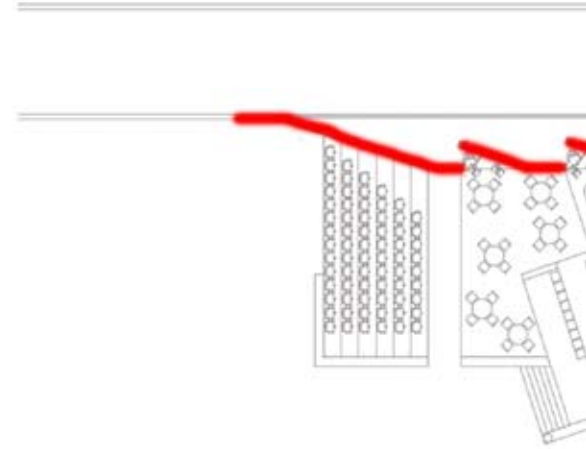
\_Layout diagram highlighting skin articulation on plan
